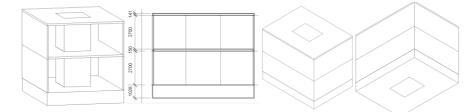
REVIT BIM MODEL – ATRIUM SPACE WITH ROOF AND FLOOR AS TWO ELEMENTS – LEFT: 3D VIEW. MIDDLE: ELEVATION VIEW. RIGHT: ROOF AND FLOOR AS TWO ELEMENTS
